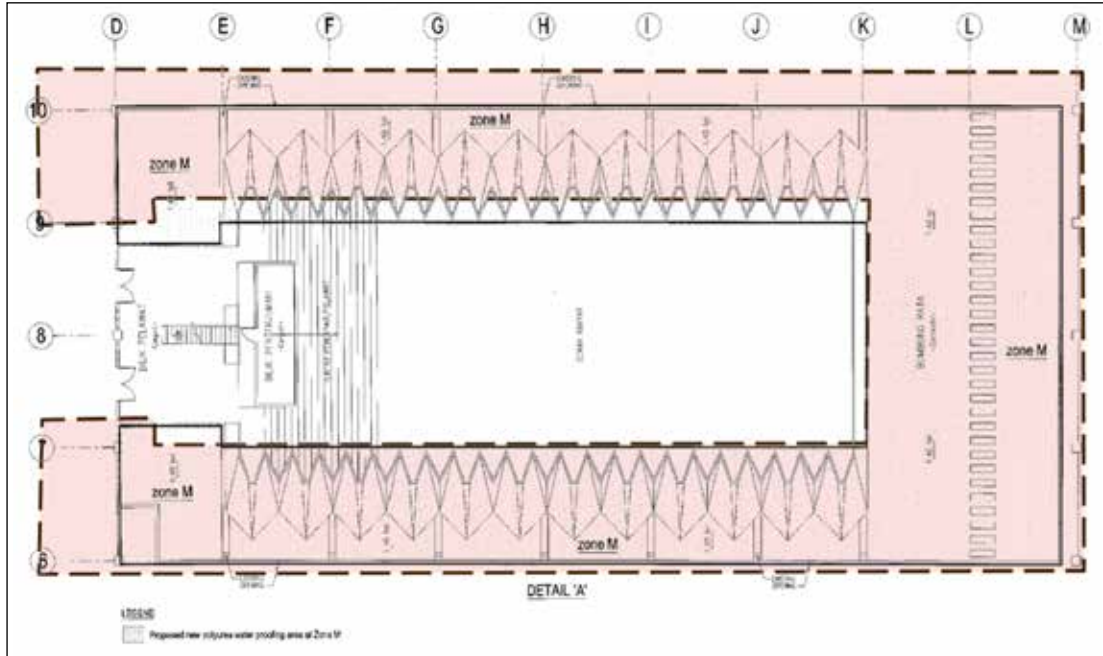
A plan drawing of the pool shaded, surrounding the Pinnacle section
